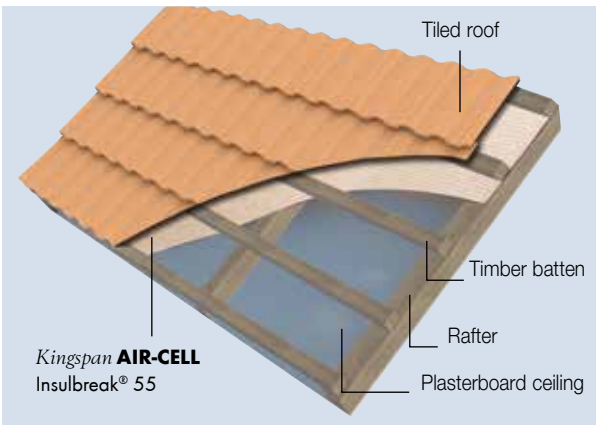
Kingspan AIR-CELL Insulbreak® 55 in a tiled roof with a raked ceiling
